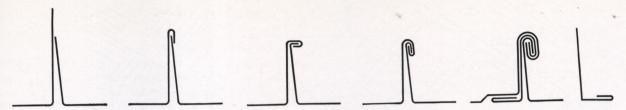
Standing-seam detail as formed on the job, for use with pan type roofing.
